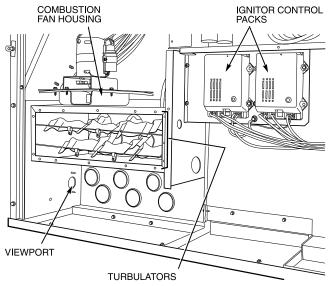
Typical Heating Section With Main Burners Removed (48HJE015, 48HJE017, and 48HJD025 Shown)
